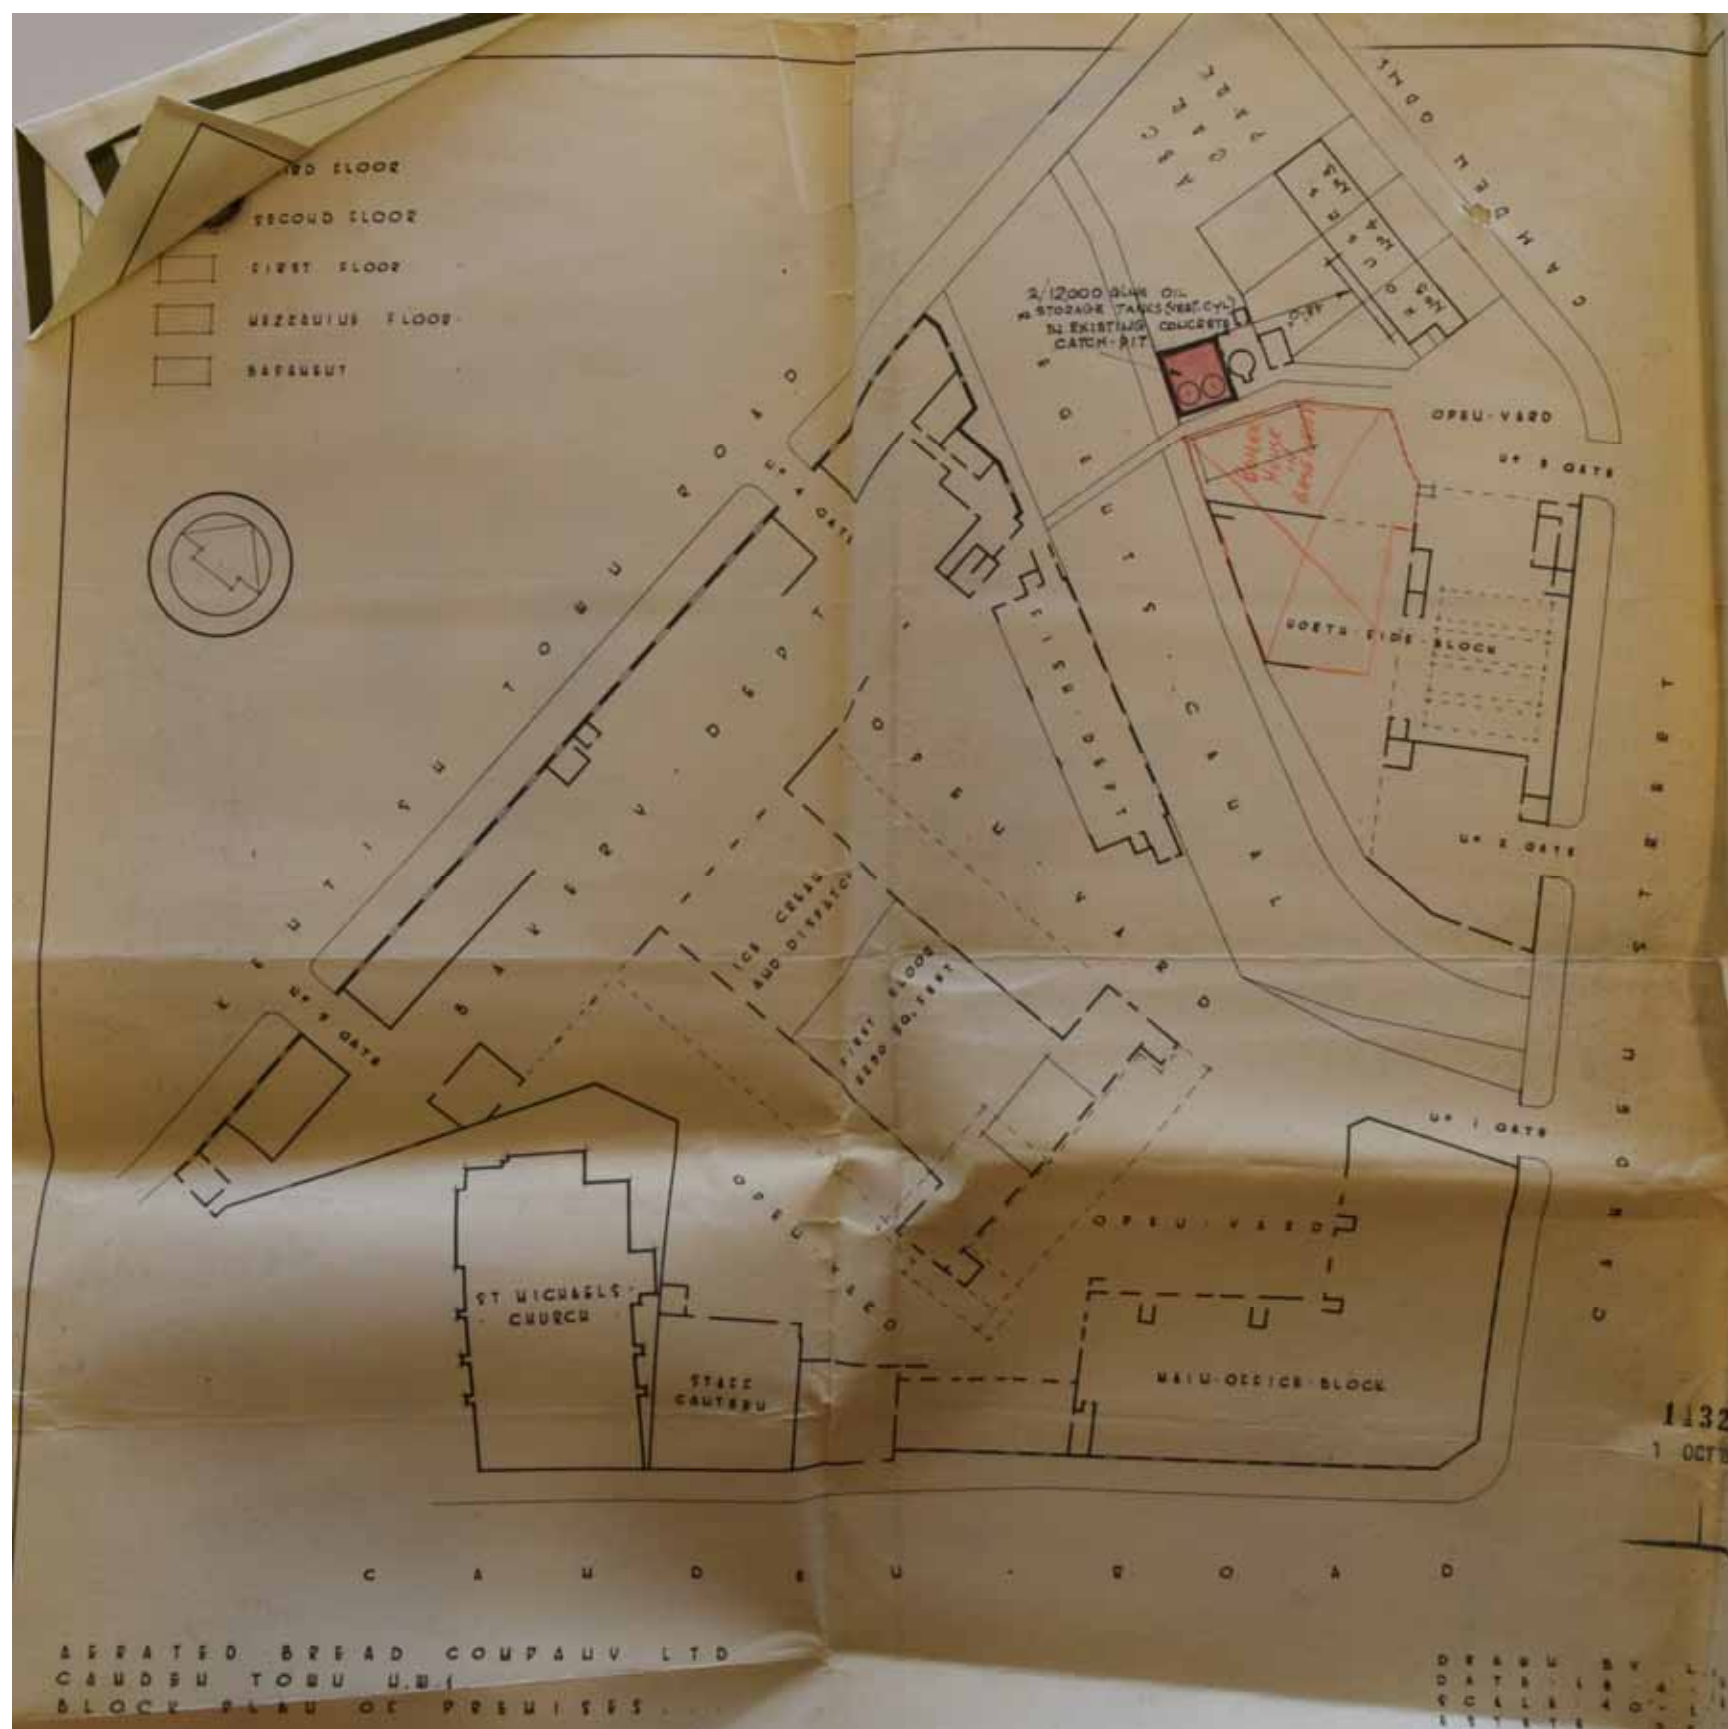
1959: Site plan showing the ABC complex occupying the site between Kentish Town Road and Camden Road.
